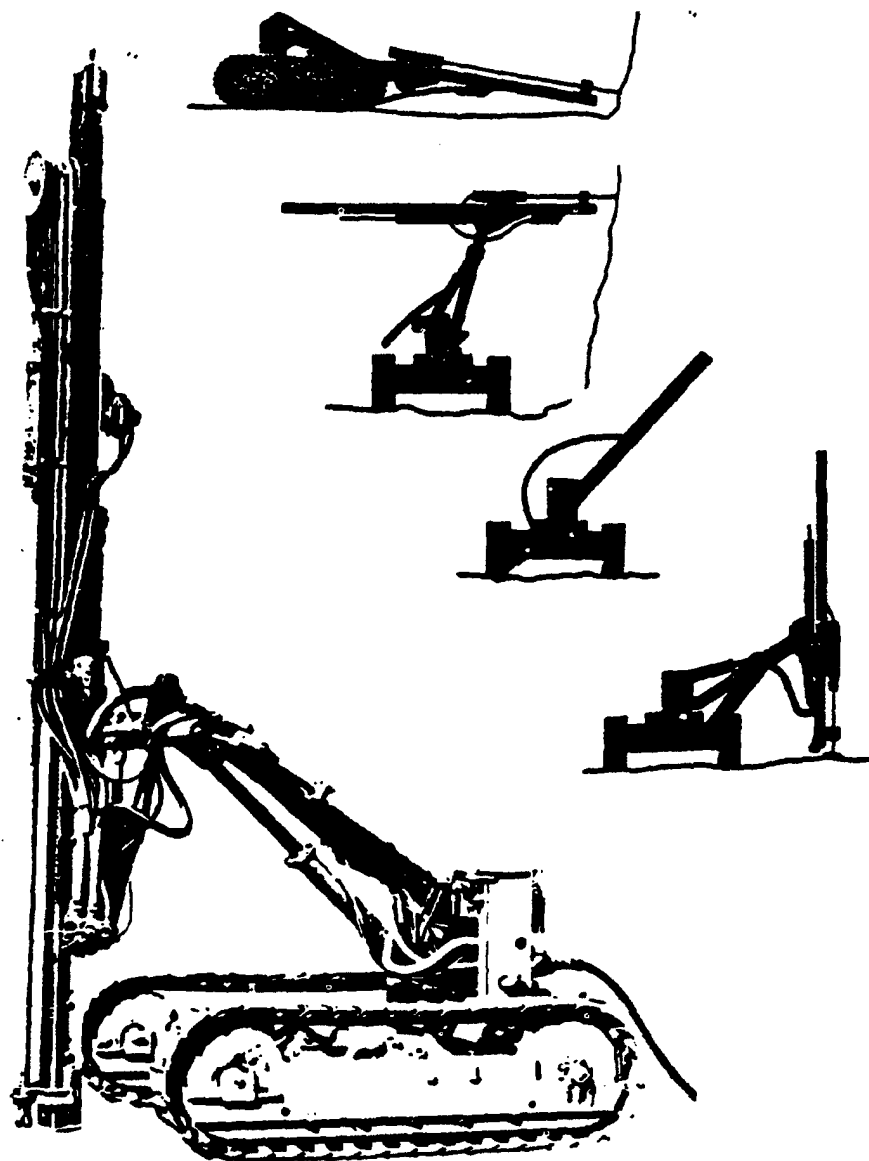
Crawler drill capable of drilling holes from 1-3/4 to 3 in. in diameter. Insets show setup for various hole inclinations<sup>9</sup>
